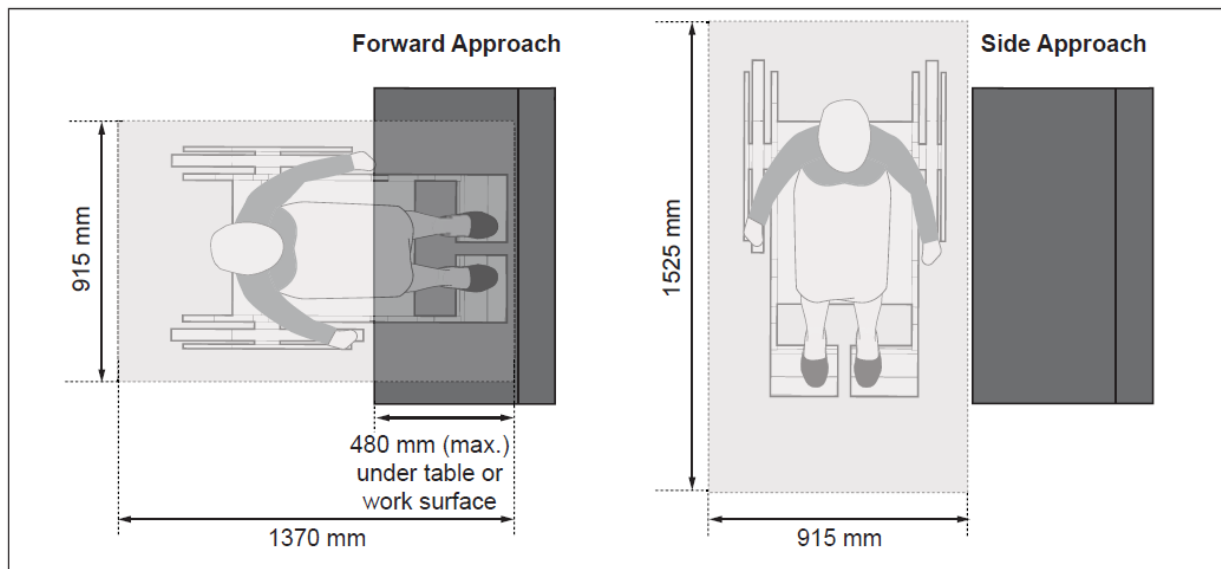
Clear Floor Space Requirements and Approach at Tables and Work Surfaces – Plan View
